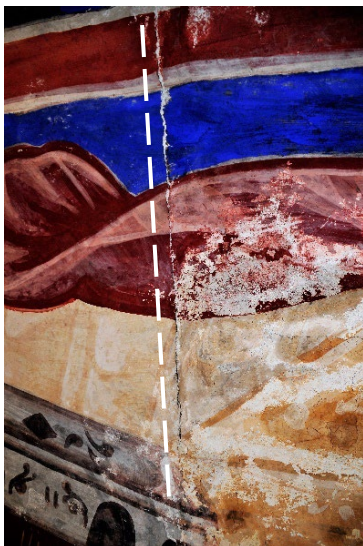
, 49. North arm – west wall: shifting of the building ashlars
